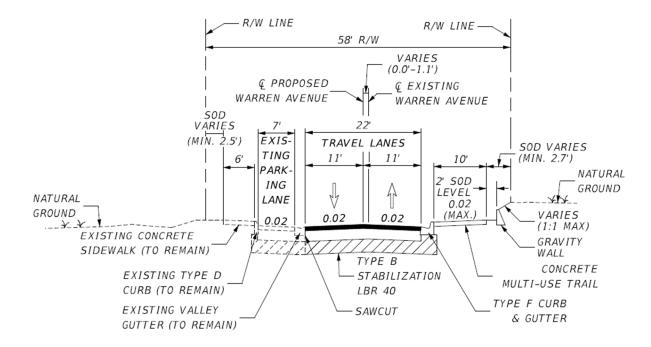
Alternative 1 Typical Section from 700 ft West of Milwee Street to 440 ft West of Milwee Street
